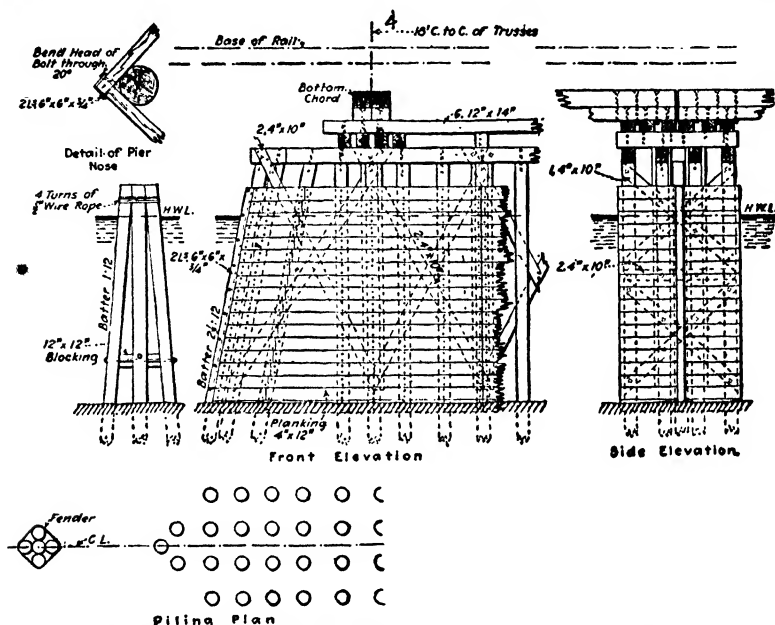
Timber Pile Pier Used on Alaska Government Railroad.
